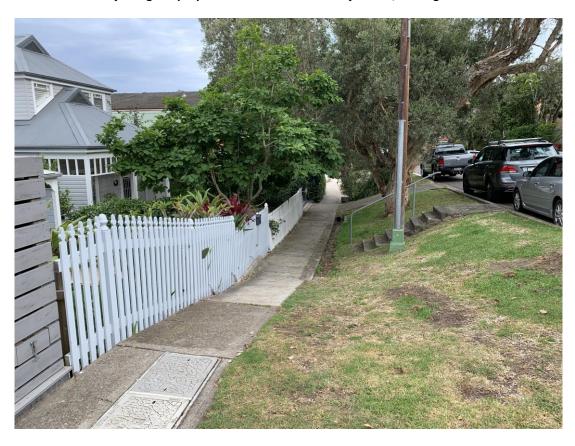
View of the existing front boundary conditions and footpath adjoining the site, looking north-west
